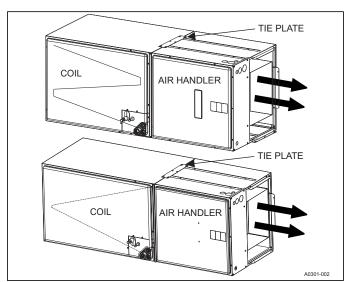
CM Horizontal Right Application with Modular Air Handler
